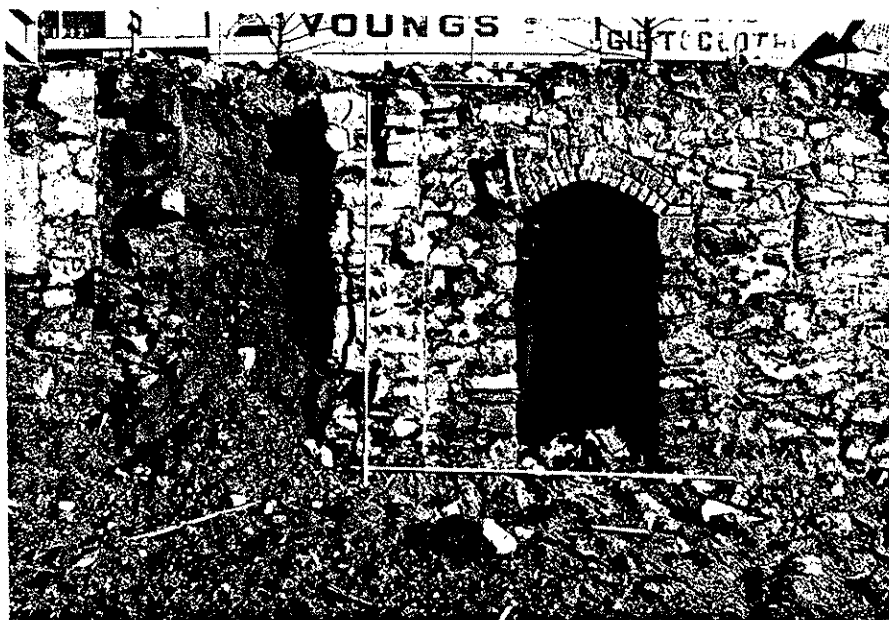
15-17 North Broad Street: view looking east at east foundation; vertical area of soil to left of range pole indicates the alleyway between 15 and 17 North Broad Street noted on historic maps; arched doorway at center right leads into stone-lined, brick-arched vault beneath sidewalk; scale in feet (Photographer: Lynn Rakos, November 1987).
